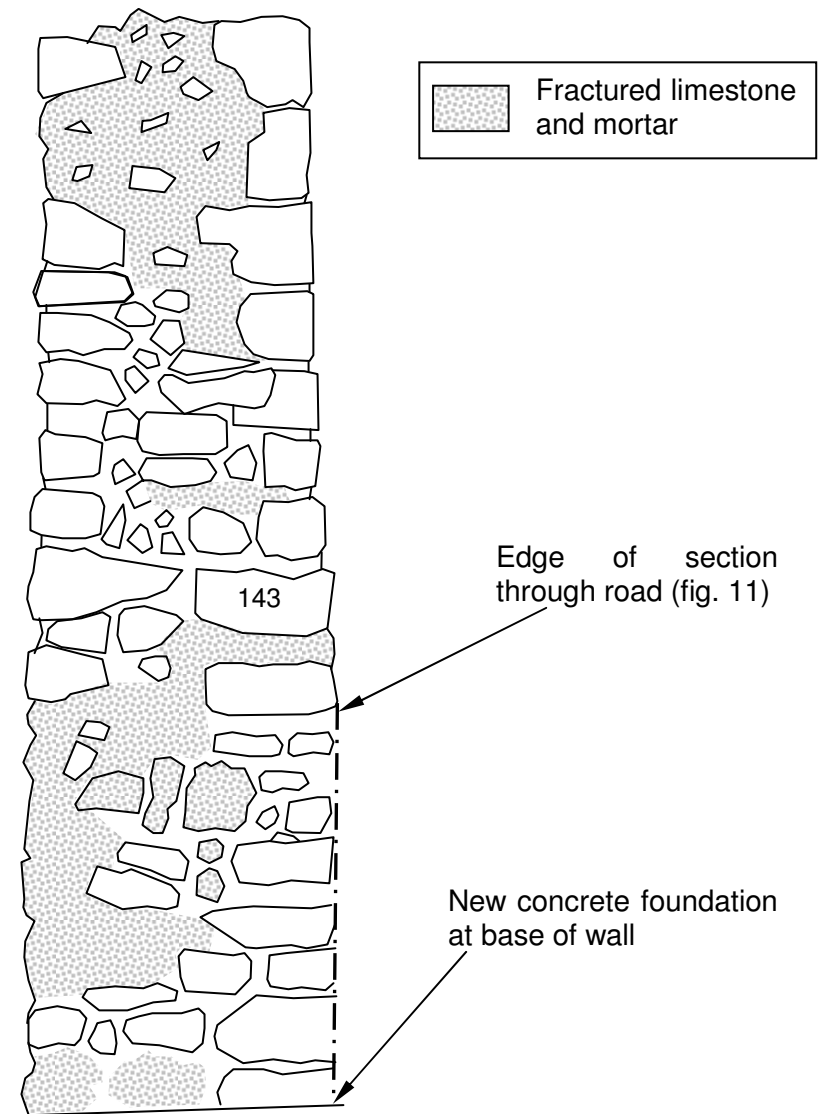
North-facing section through wall 143 near its junction with modern brick wall 144, at scale 1:20.
